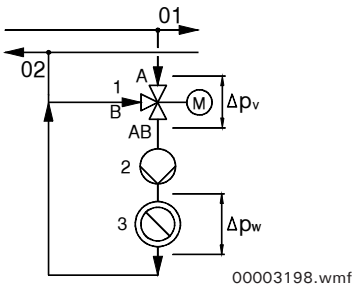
mixing valve (2 ins, 1 out) secondary circuit with pump
